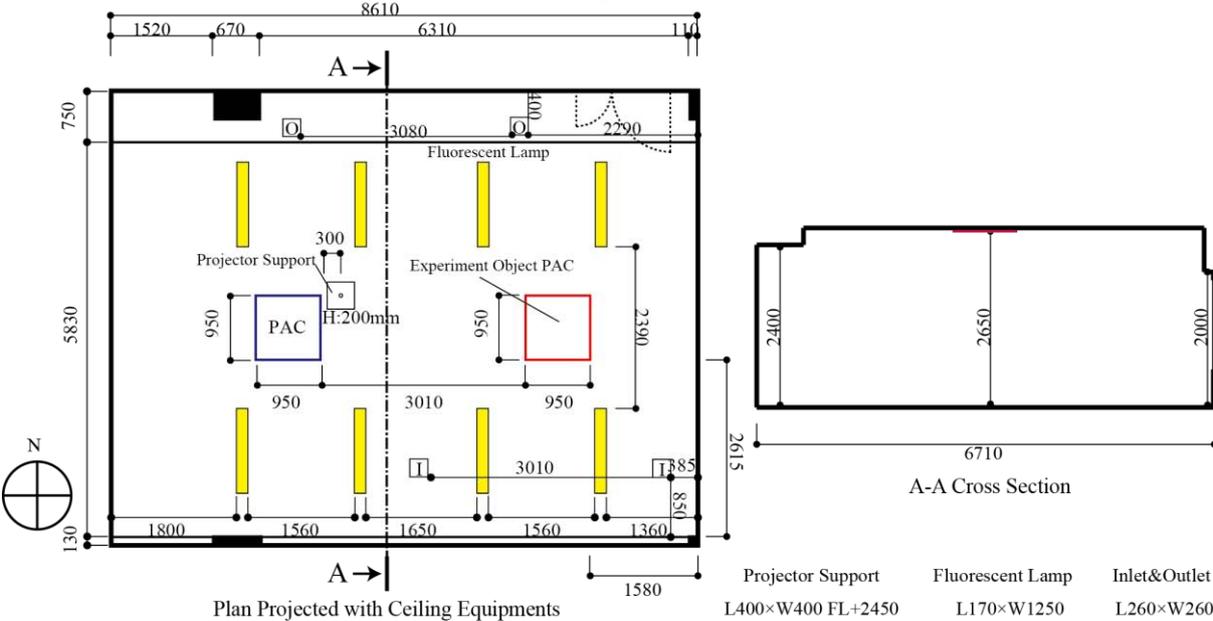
Cross section and reflecting ceiling plan of the experimental room
